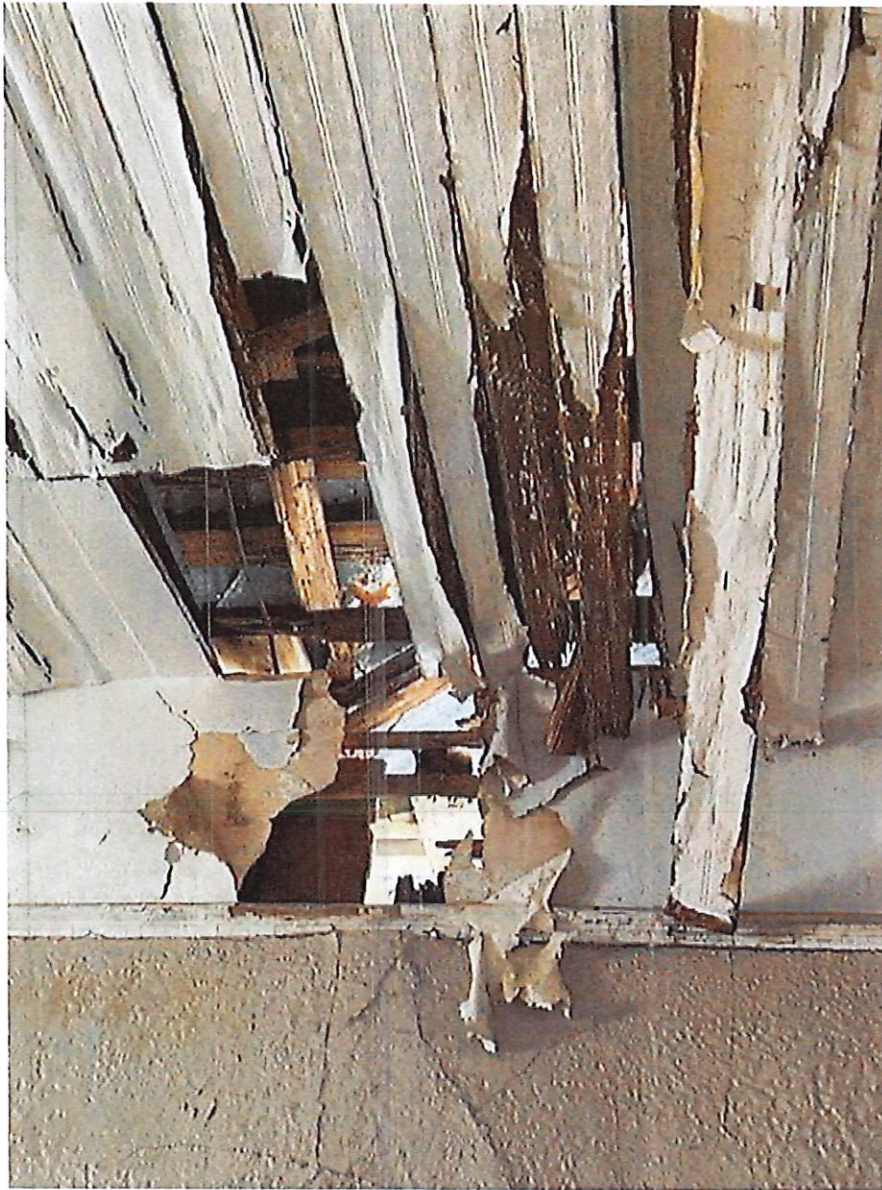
interior ceiling damage from weathering and termites cross bracing and purlins can be seen in the background
